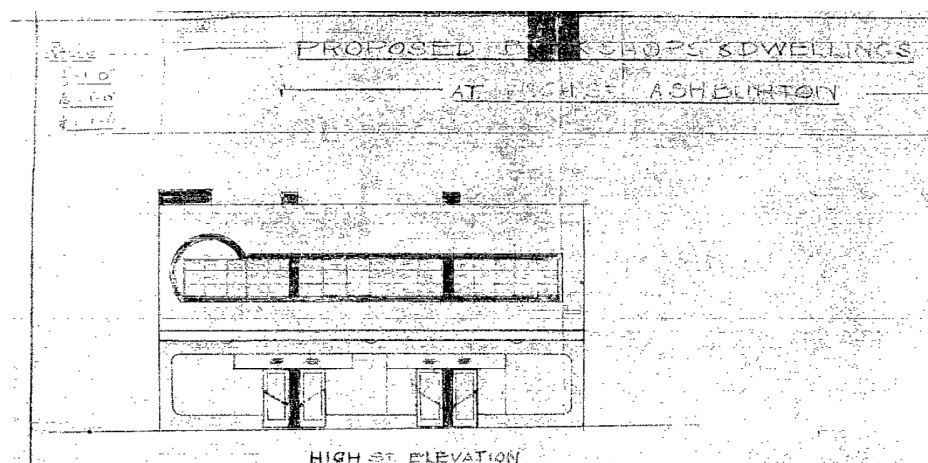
Extract of original architectural drawing, 174-178 High Street, Ashburton showing High Street Elevation. Designed by G. James 1950. (Source: City of Camberwell building permit plans)
